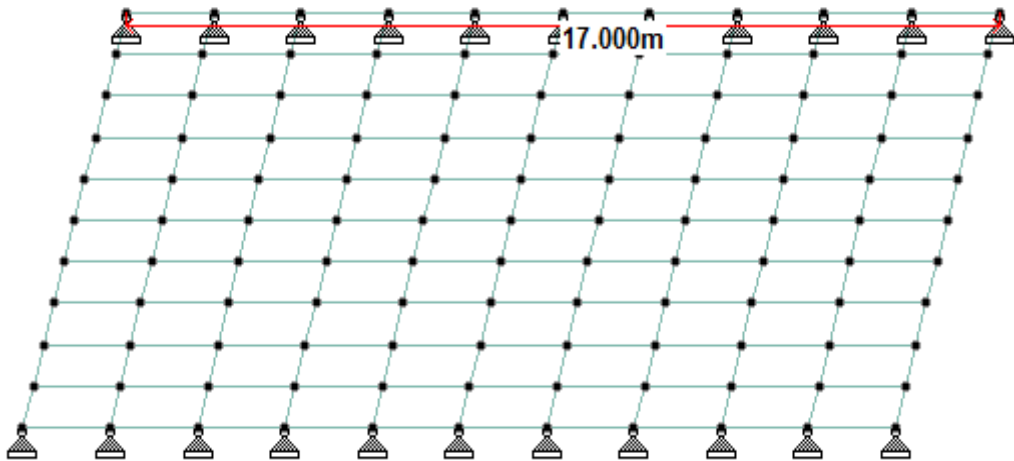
Plan view of slab with 17m span length at 15° skew angle
